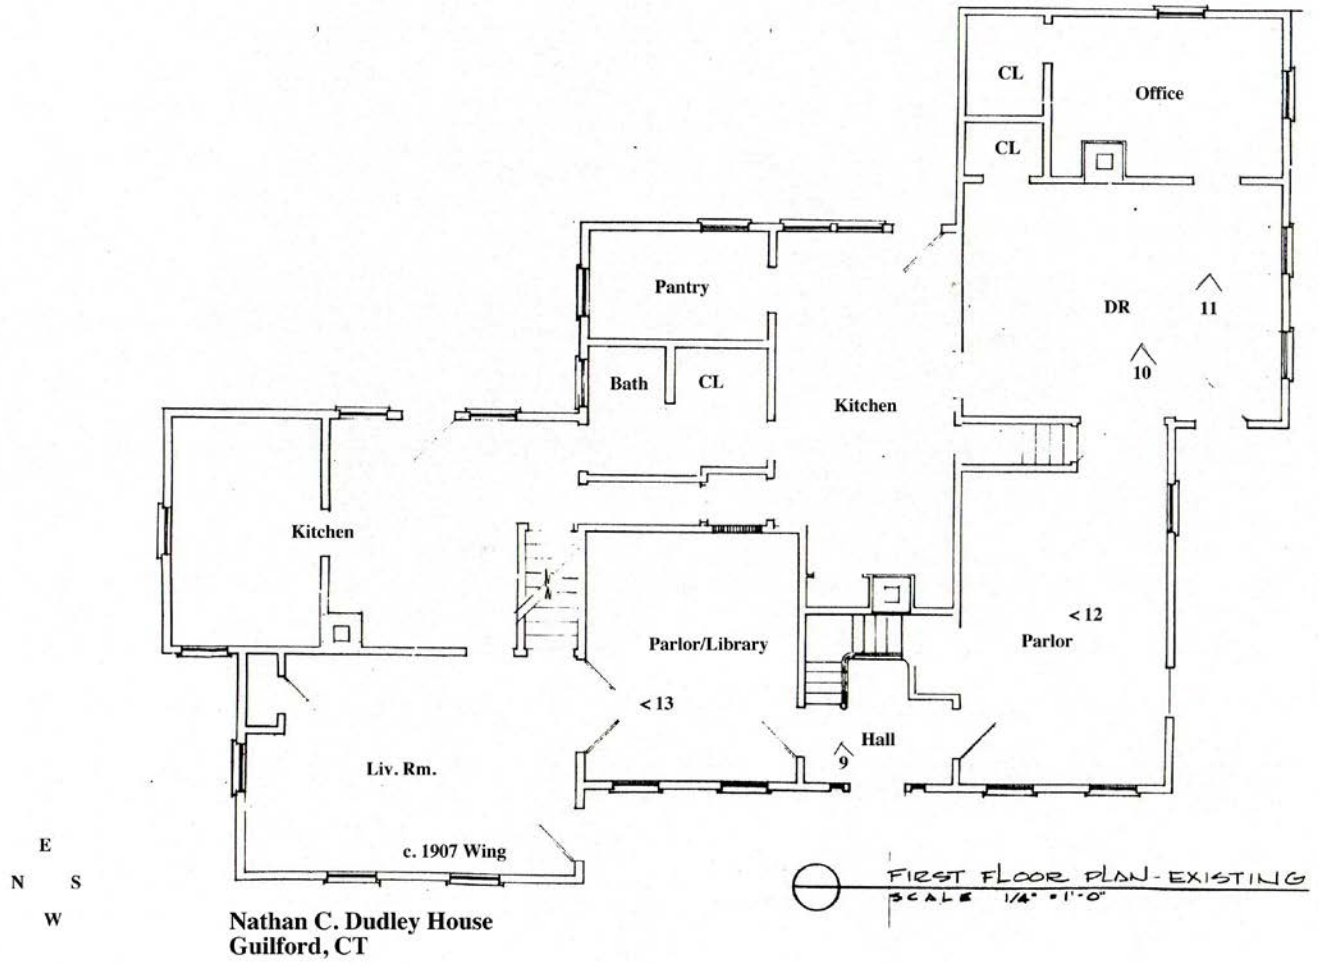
Nathan C. Dudley House First Floor Plan and Photograph Key.
